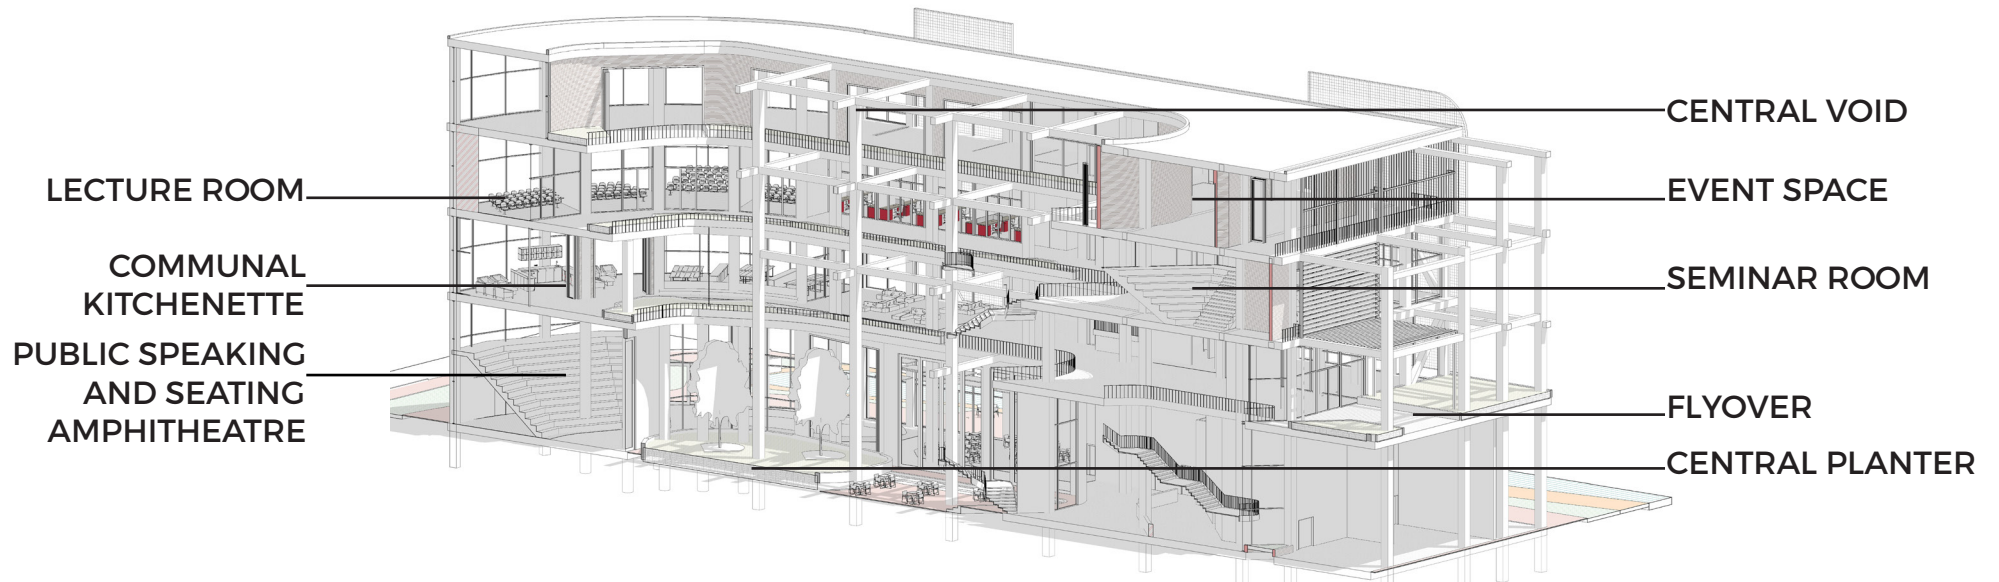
STRIP SECTION DATA CENTRE (AUTHOR 2021)
